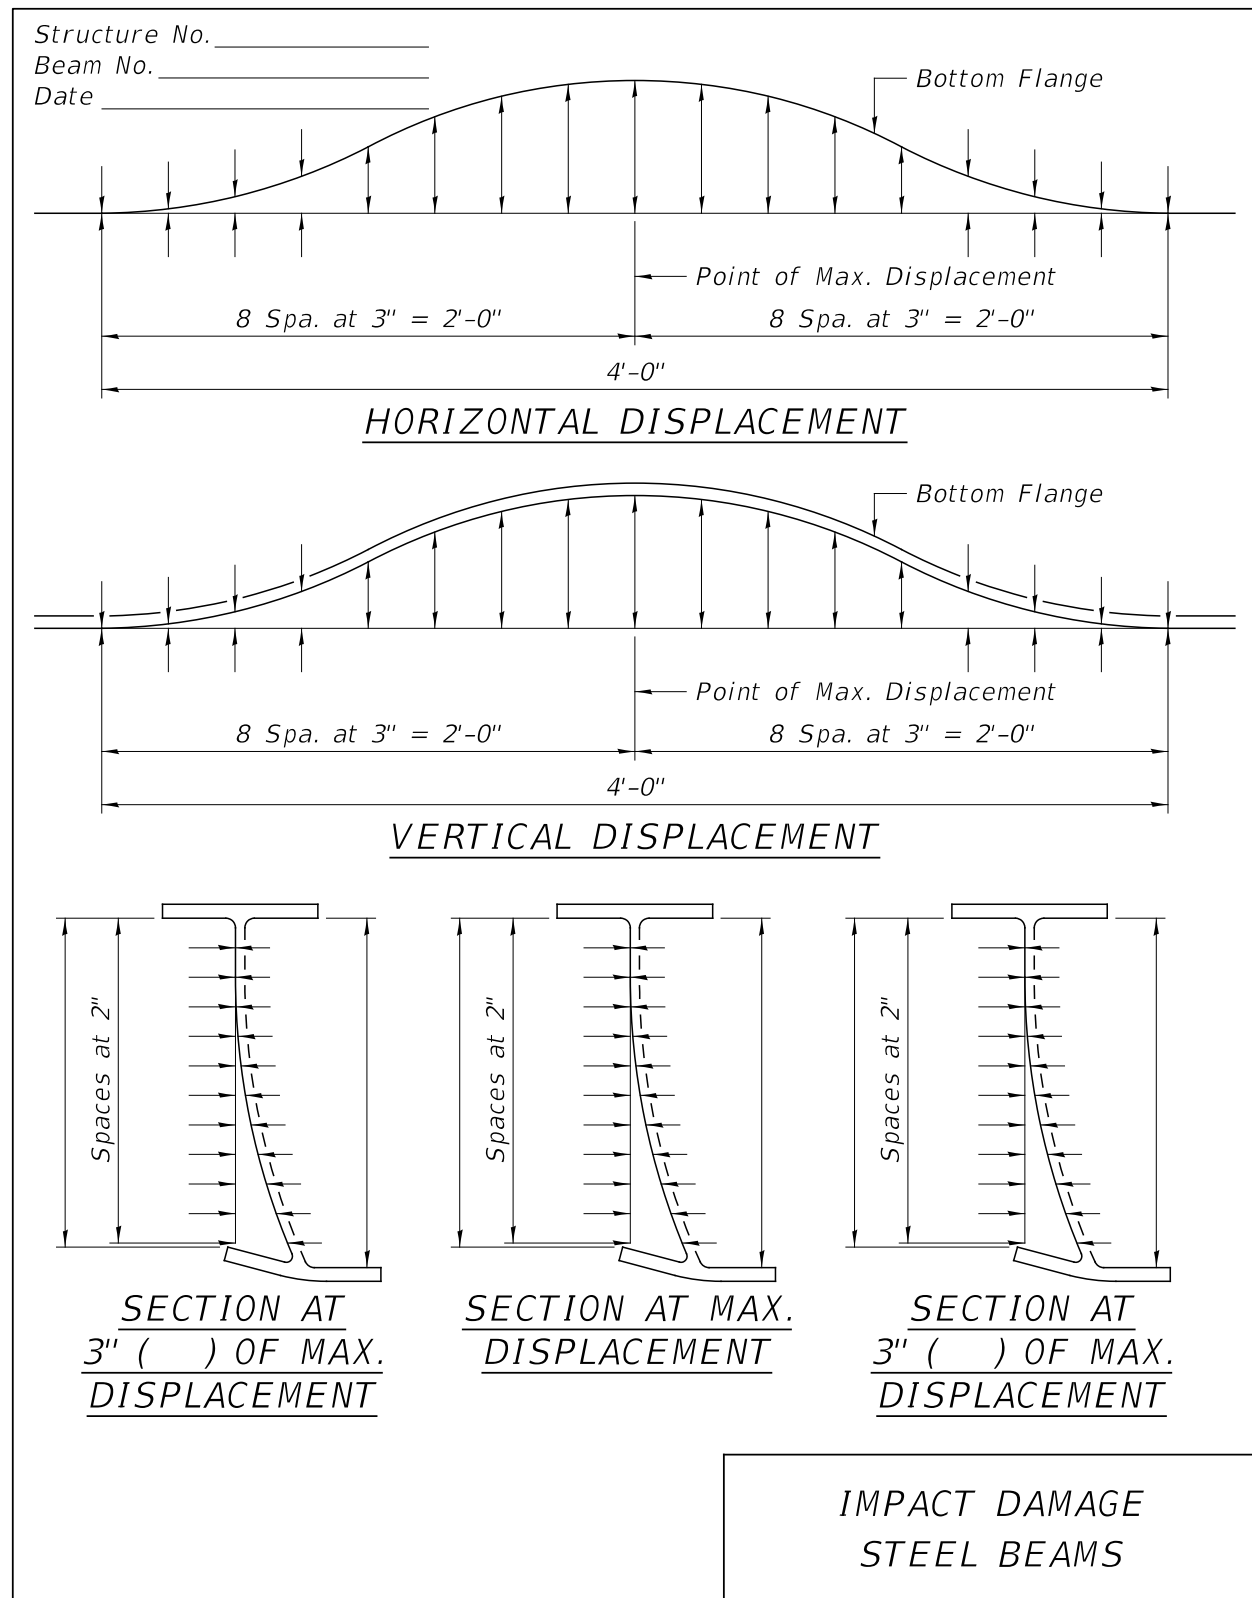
Impact Damage – Steel Beams
